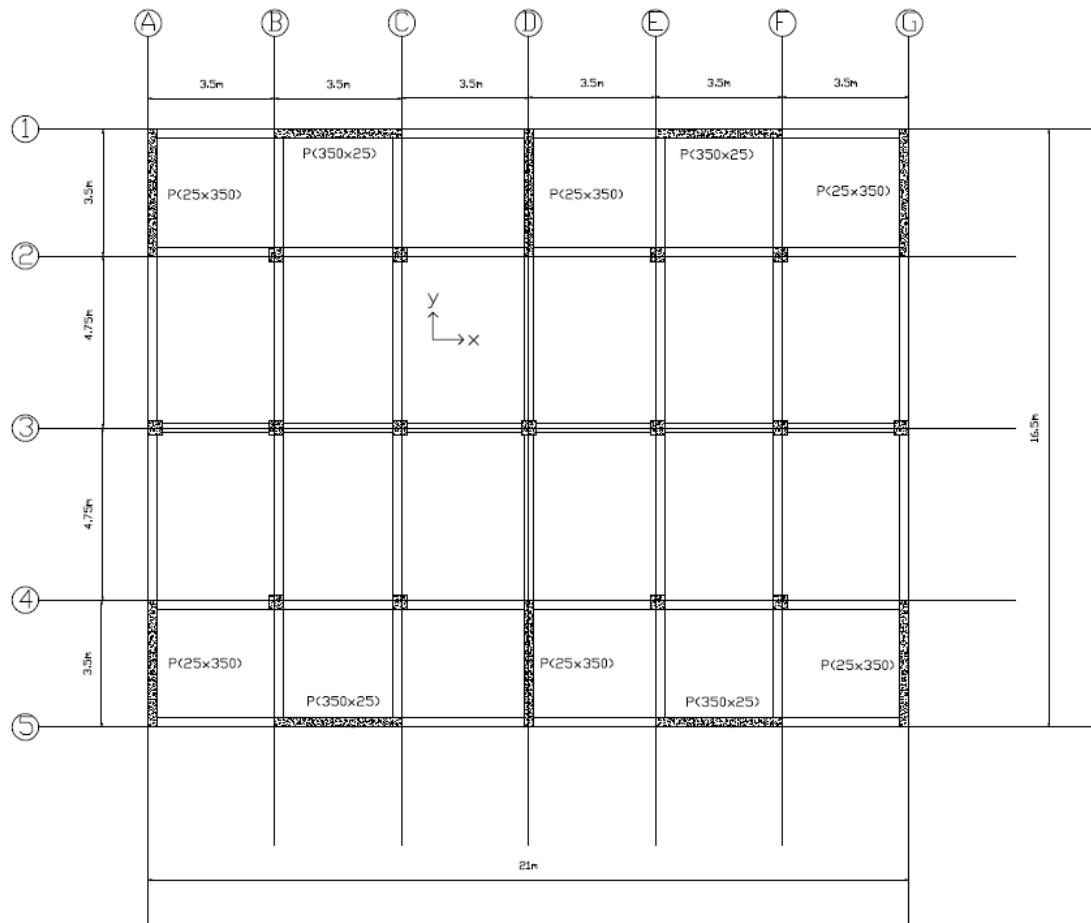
Plan of Model 5 with Wall Area to Floor Area Ratio of 1.0% in X-direction and 1.5% in Y-direction
